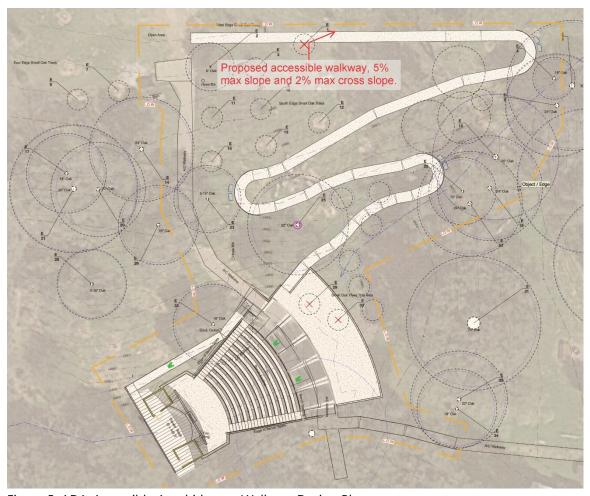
ADA-Accessible Amphitheater Walkway Design Plans
